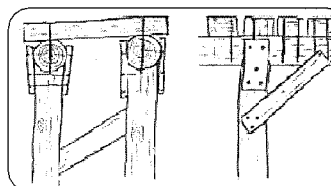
BRIDGE STRINGER SUPPORT AND CROSS BRACING
